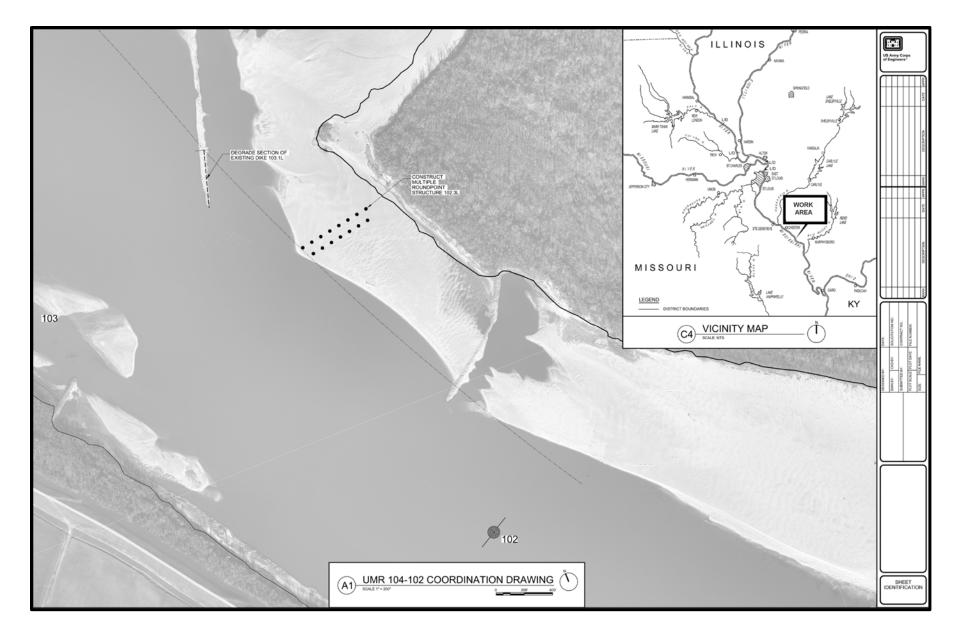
Proposed construction and modification of river training structures at the downstream portion of the work area.
